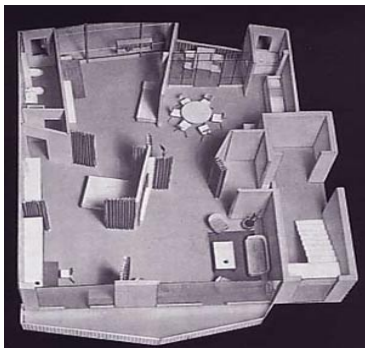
Gio Ponti, Single-Space House for Four People, 1957.
